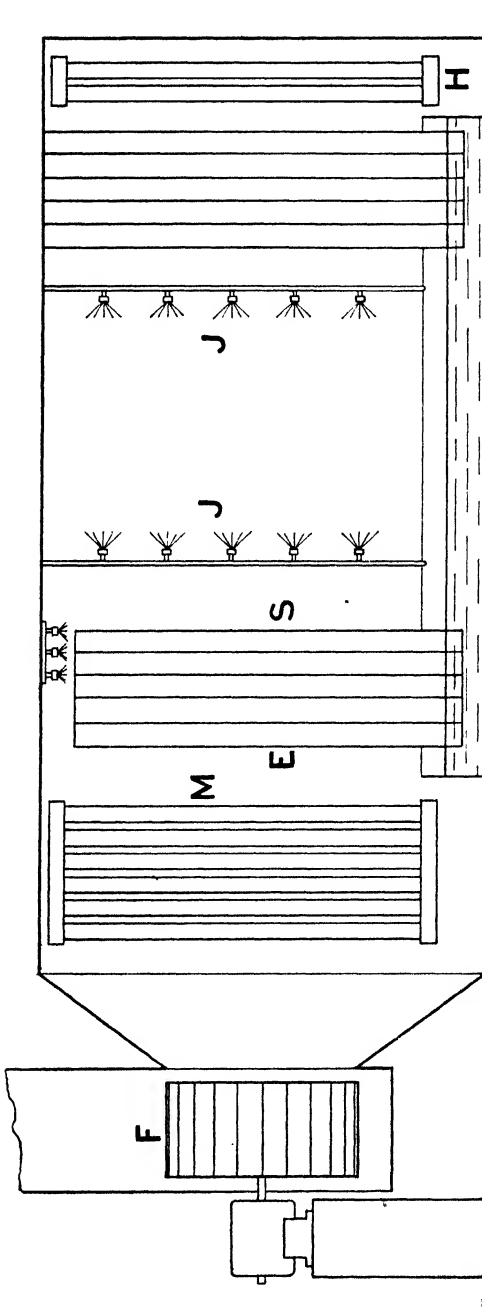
Diagram showing the Lay-out of a Central Station Air Conditioning Plant.
